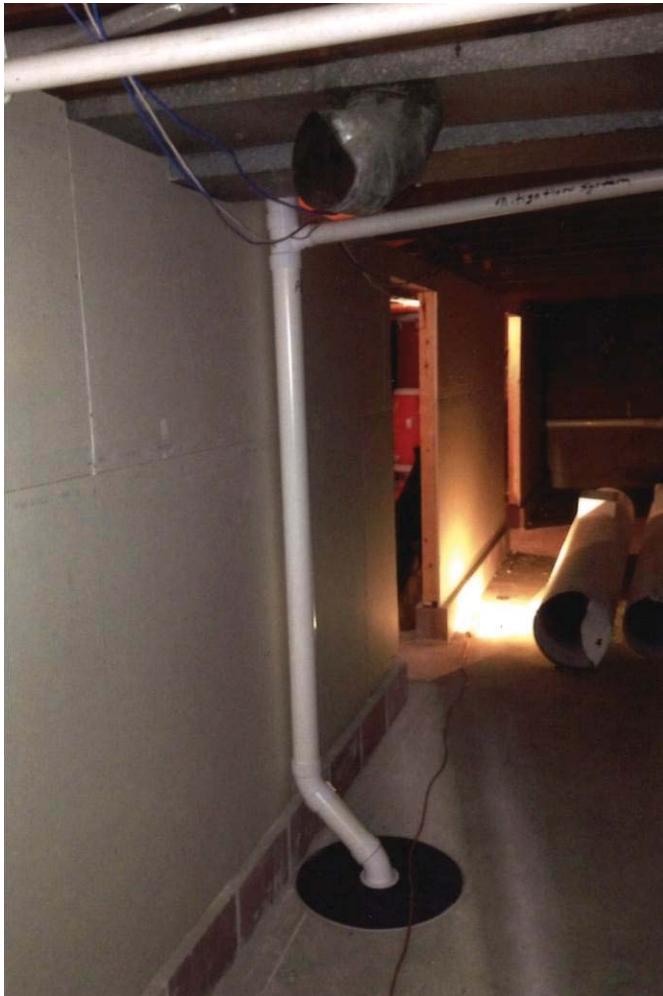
View looking northwest at mitigation system Pickup Point #3 (PU-3) in basement of 2803-2807 University Avenue.
